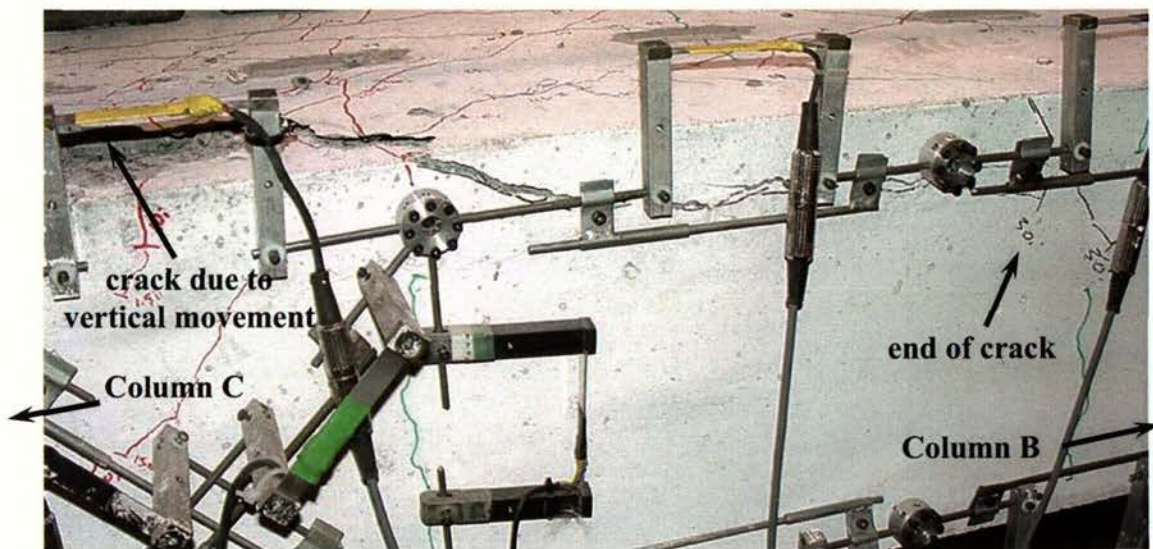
Elevation view of perimeter frame of extension of crack past mid-span of bay 'B' - 'C', at 3.0% interstorey drift.
